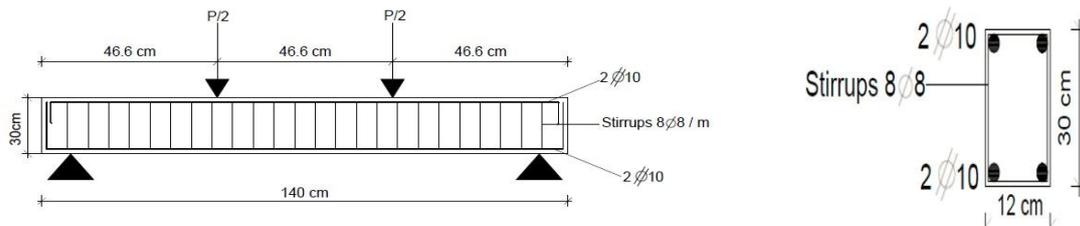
Longitudinal reinforcement detailing and loading configuration of the reinforced concrete beam specimen
